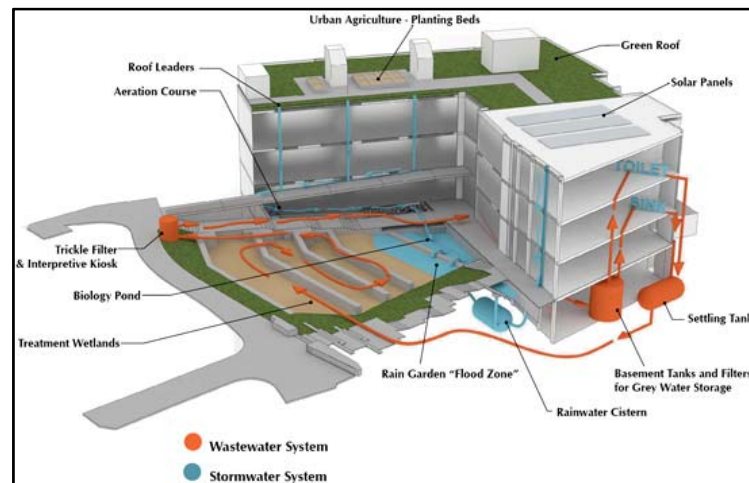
The wetland machine of Sidwell Friends School [68]
